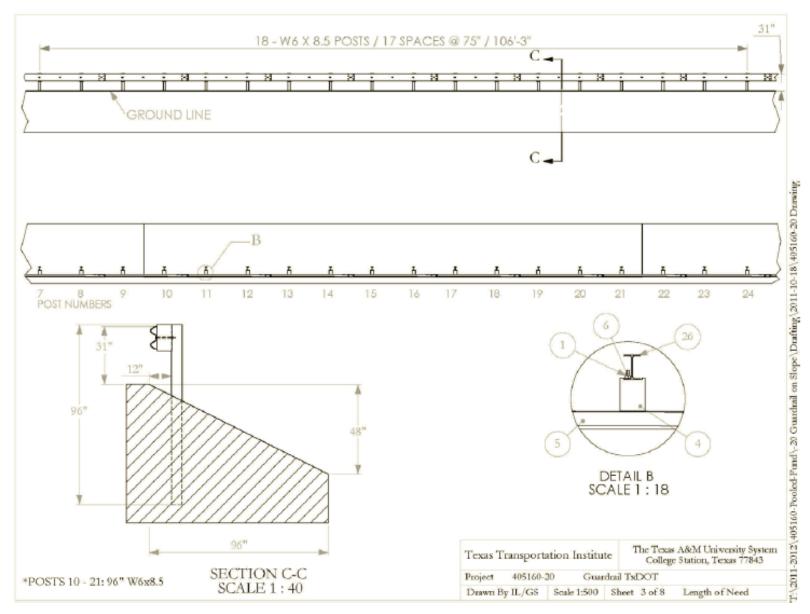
Details of the Test Article Installation for Test 405160-20-1 (8).
